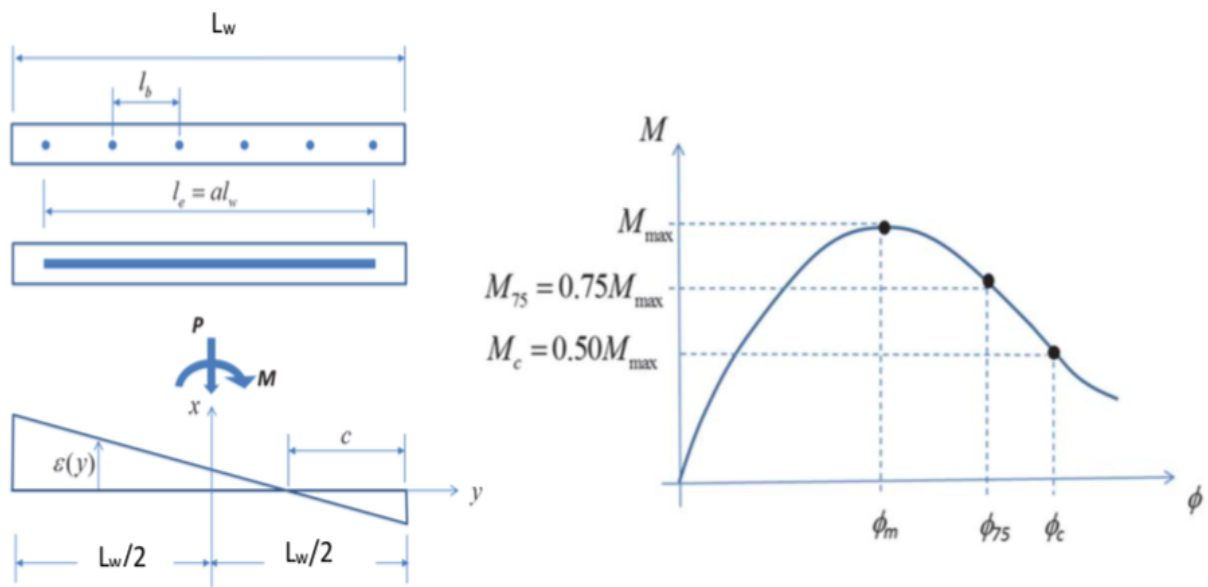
Moment curvature relationship of a reinforced masonry wall with milestone points identified [Adapted from Pantazopoulou (2023)]
